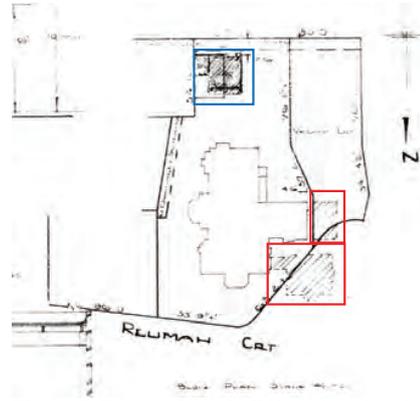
Extract from building plan showing proposed garage (in blue) and sections to be demolished (in red) (Source: BP 18378, held Boroondara City Council)
